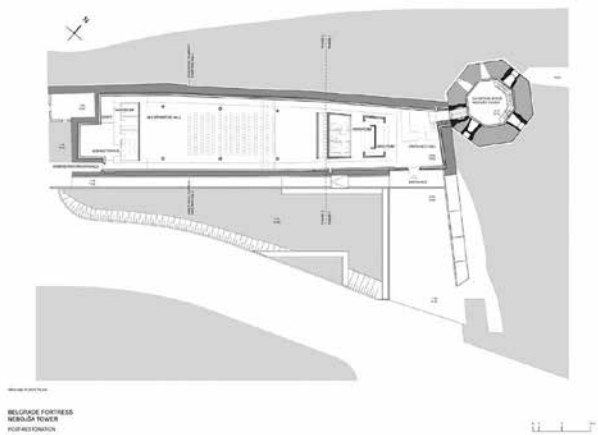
Plan Tower complex with entrance zone, multifunctional hall and exhibition space in Tower. <https://dejanmiljkovic.rs/sr/>
